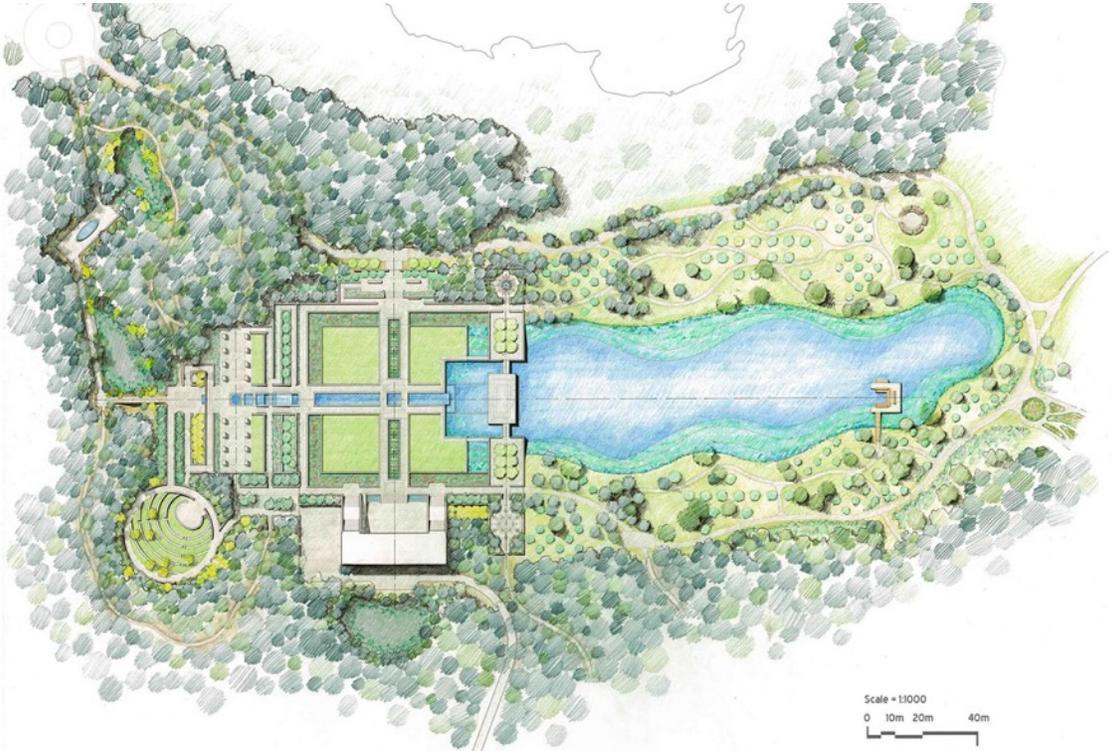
The Aga Khan Garden, master plan. Sketch by Nelson Byrd Woltz.
